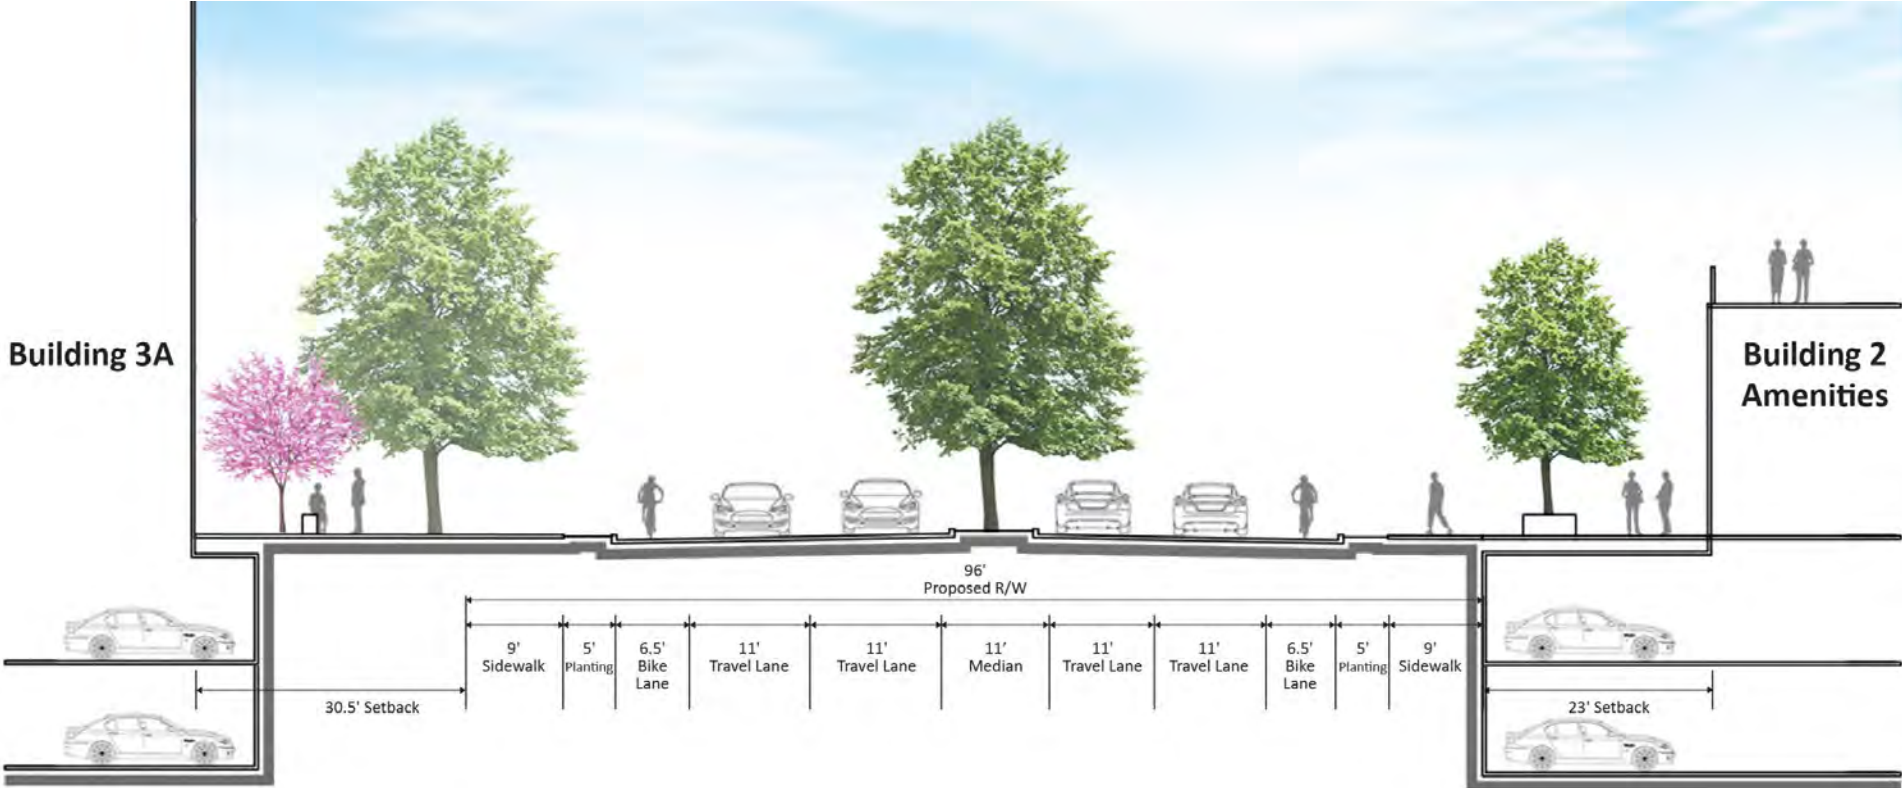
Southline Avenue Roadway – Cross-Section B
